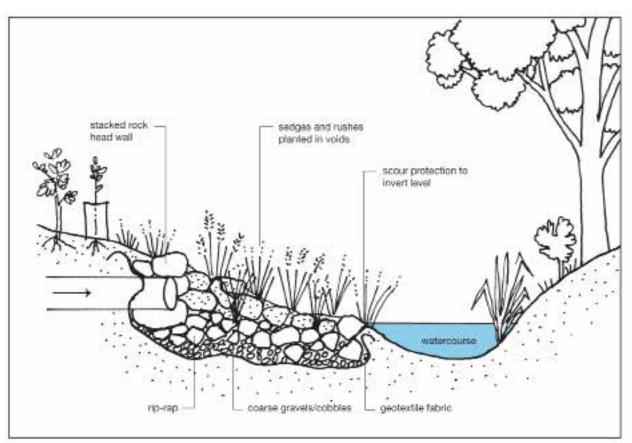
'Natural' Outlet Structure (Source: Department of Water and Energy 2008)
